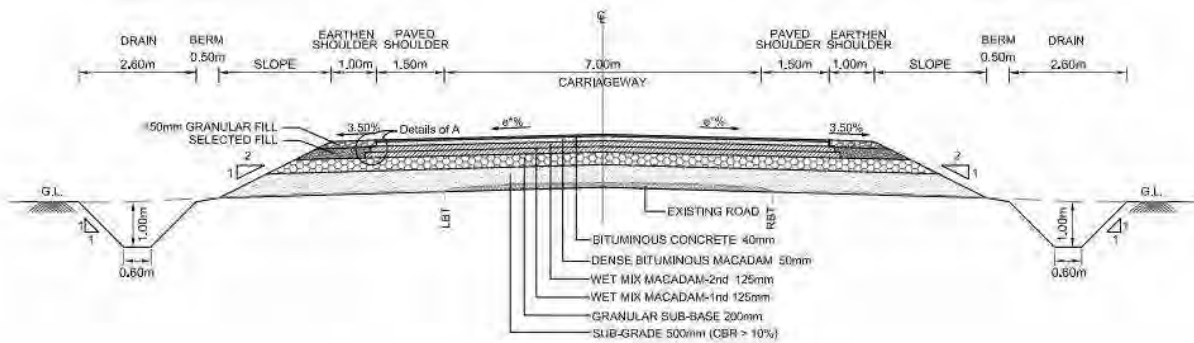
(TCS 5) 2-Lane Carriageway with paved shoulders (Reconstruction in Submergence area)
